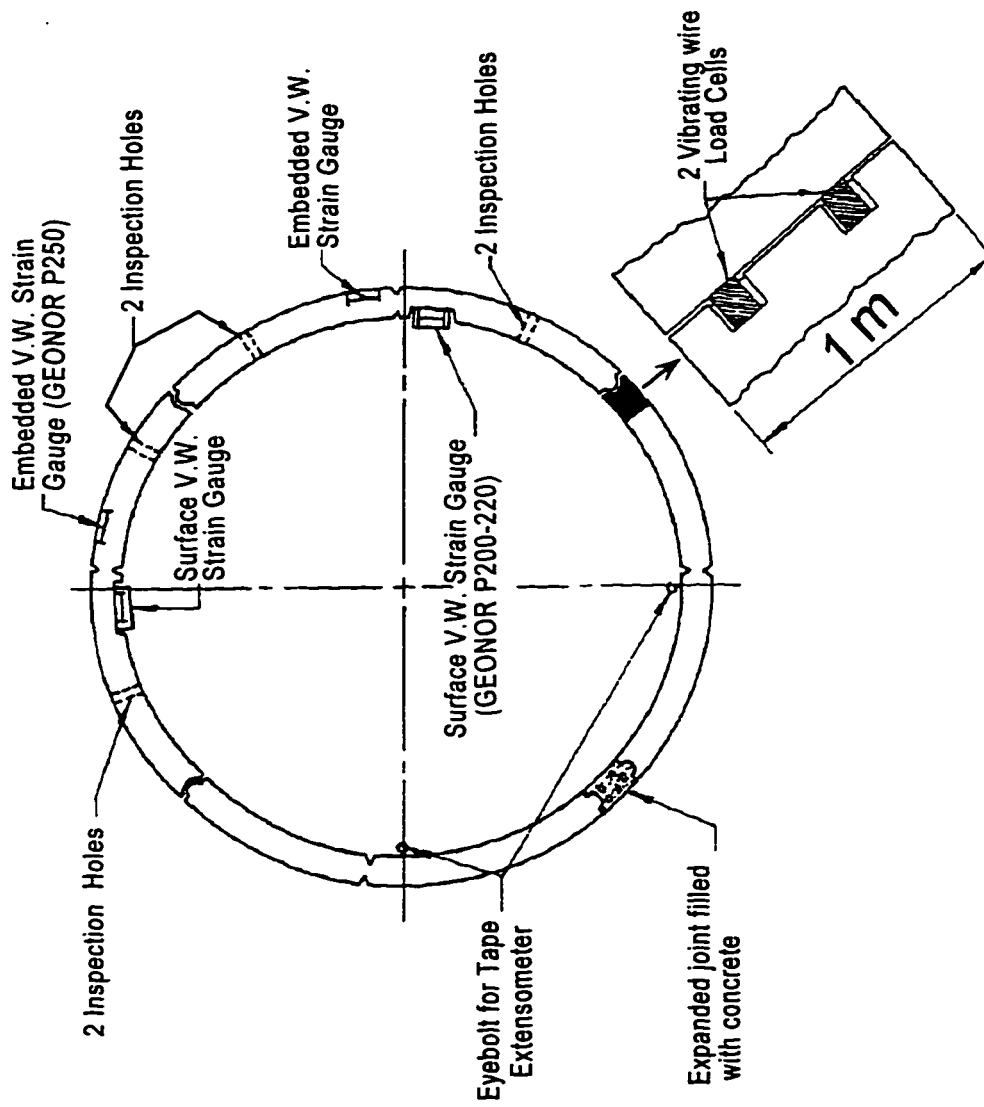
Details of Lining Instruments of Test Section 2 of Experimental Tunnel
